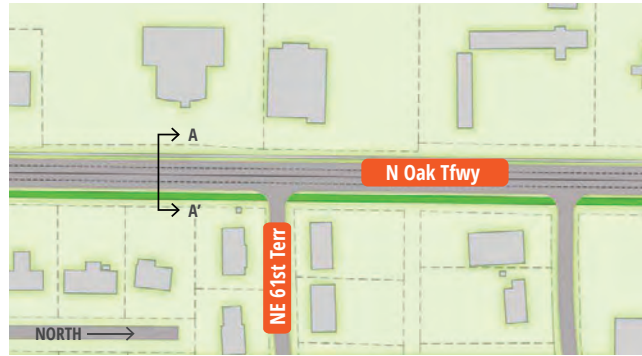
TYPICAL 4-LANE CONFIGURATION - PLAN
